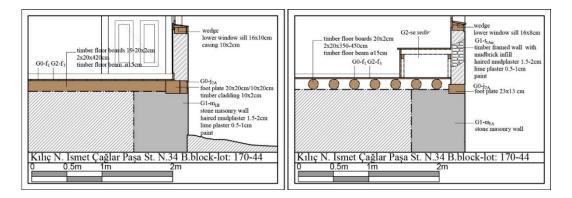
Connection detail 2, section drawing of floor beams located at the same level as the foot plate of upper floor (Kılıç N. b.block-lot: 170-44)
